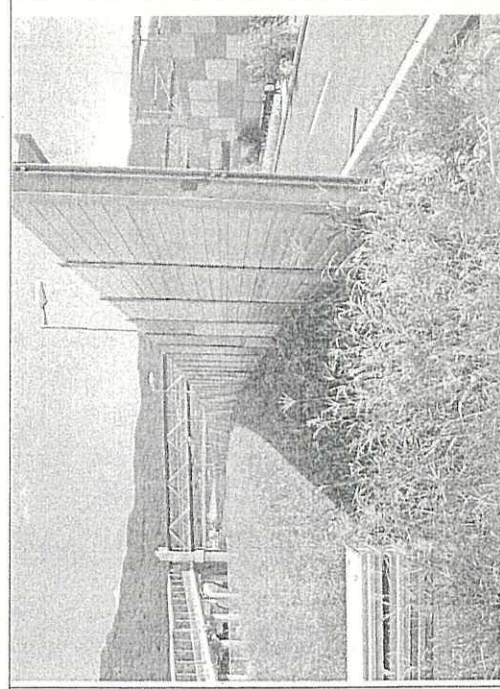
Noise barriers along the Eastern Perimeter Road
